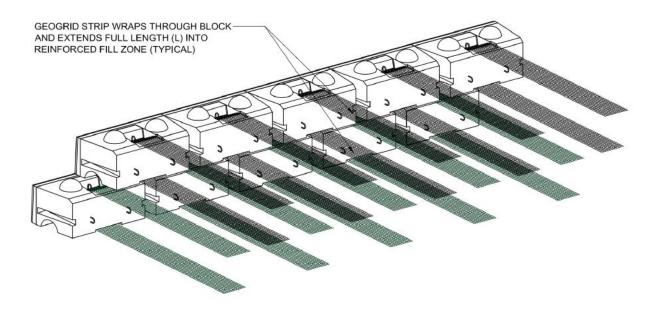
3D view of back of wall illustrating geogrid connection and resulting reinforcement configuration
